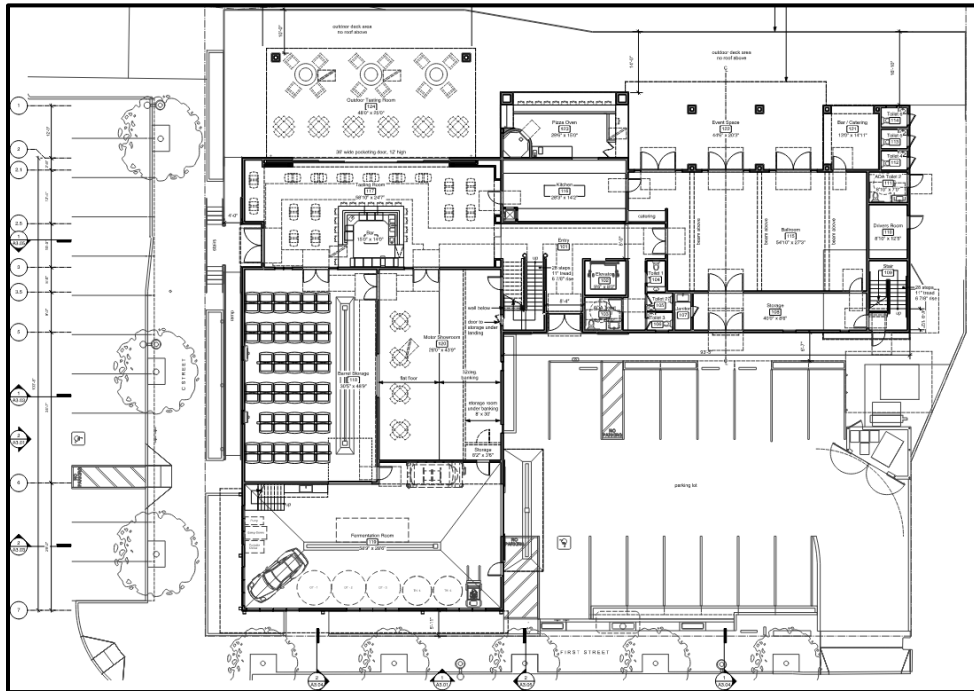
Site Plan – Modified (Attachment E, Sheet A2.02)
